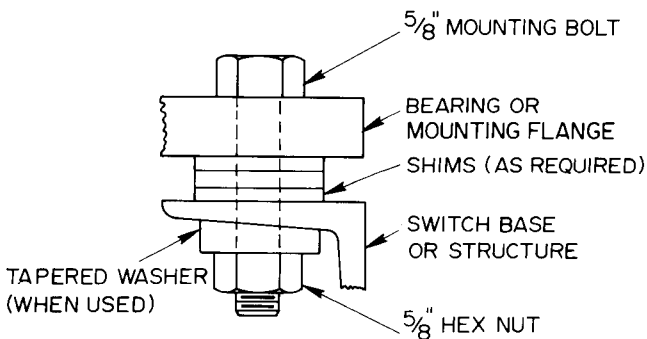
Shims used for leveling 69-thru 230-kV switches
